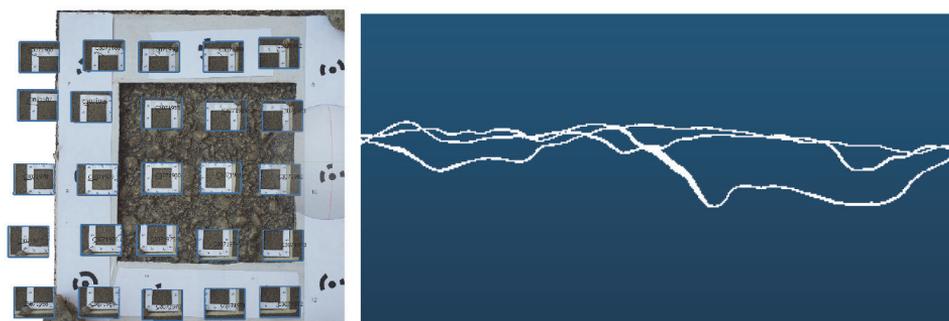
3D pavement surface model with camera overlapping views (left) and an example of resulting surface profiles (right)
